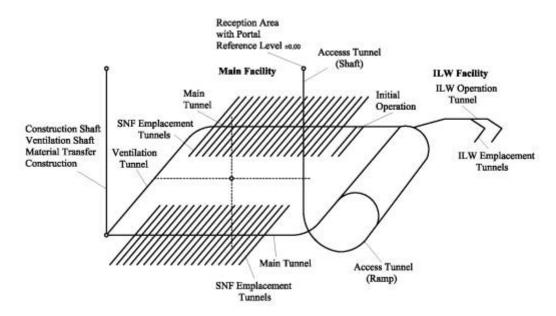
Plan view of the repository for RBMK-1500 SNF disposal of in crystalline rocks
